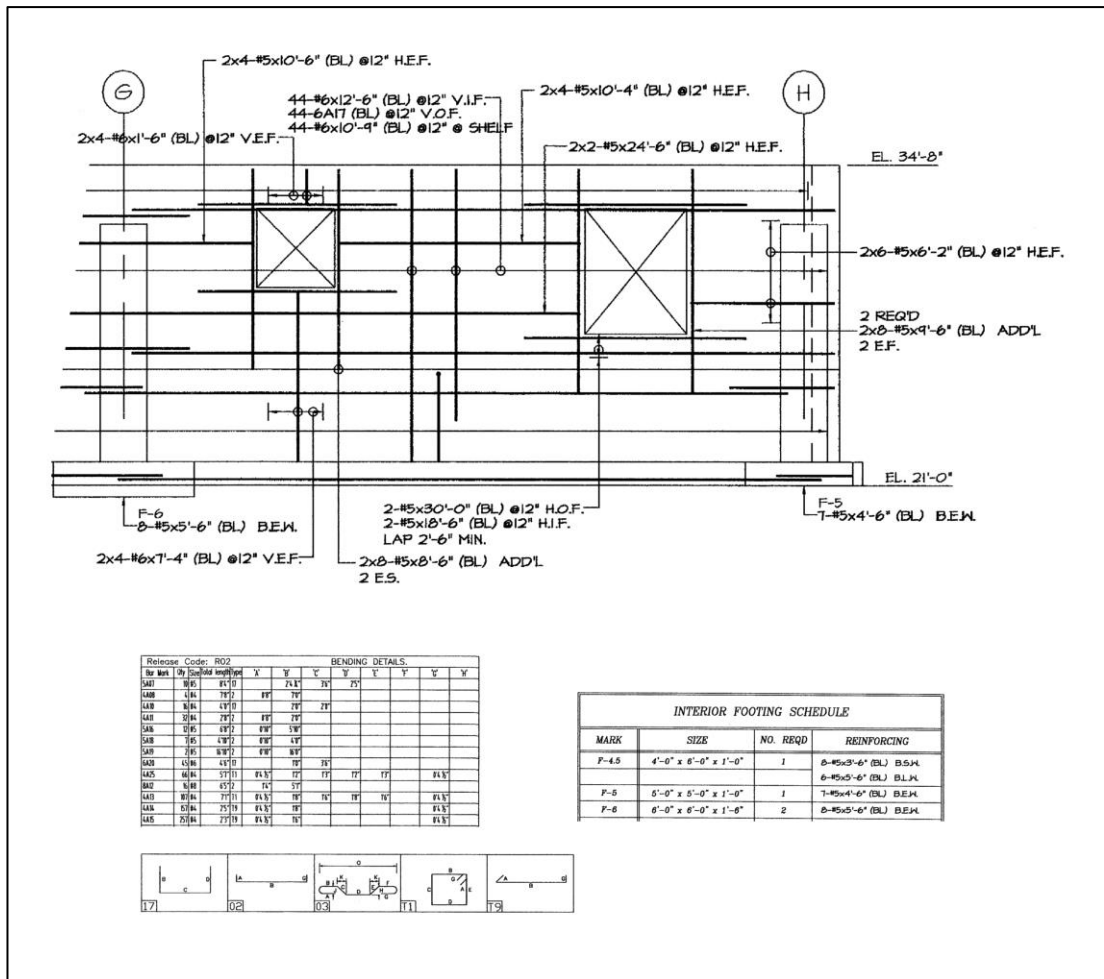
Example of steel reinforcement shop drawing on a foundation wall (Shay, 2003)
